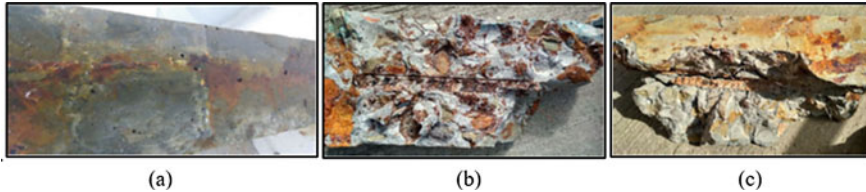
Beam specimens showing a crack propagation, b corroded steel fibres and c corrosion in steel fibres fused with Alccofine-1203
